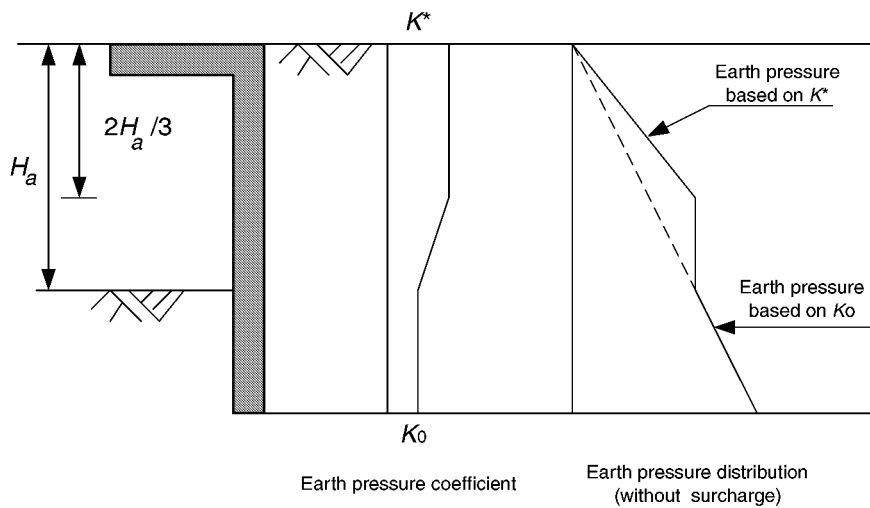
Design earth pressure distributions for full height embedded wall abutments (from BA 42/96)
